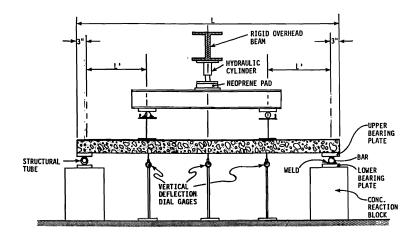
Typical Specimen Subjected to Two-point Loading
